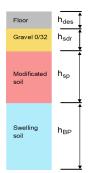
Schematic profile of the reinforced concrete floor substrate.
